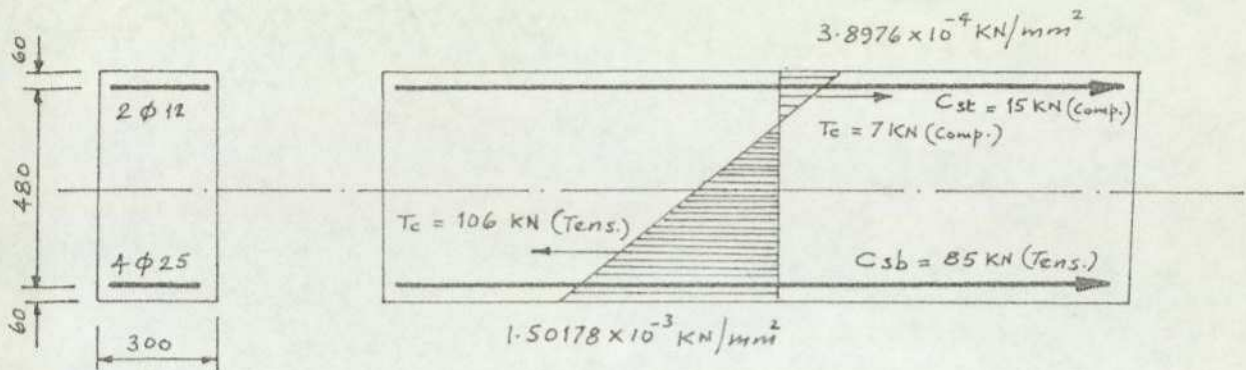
Reinforced concrete section and stress distribution due to shrinkage
